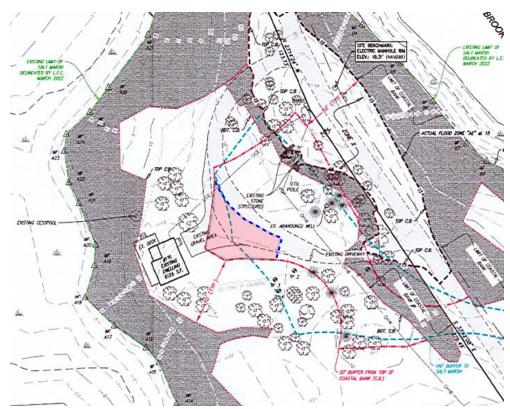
Site Plan with 50-foot Setbacks and Potential Allowable Building Envelope
